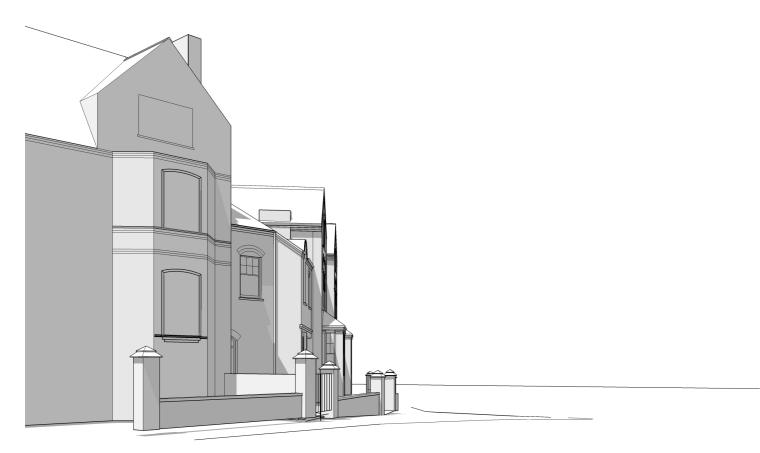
Sketch model, view looking towards proposal to No.1 Chester Road from Dartmouth Park Hill.
